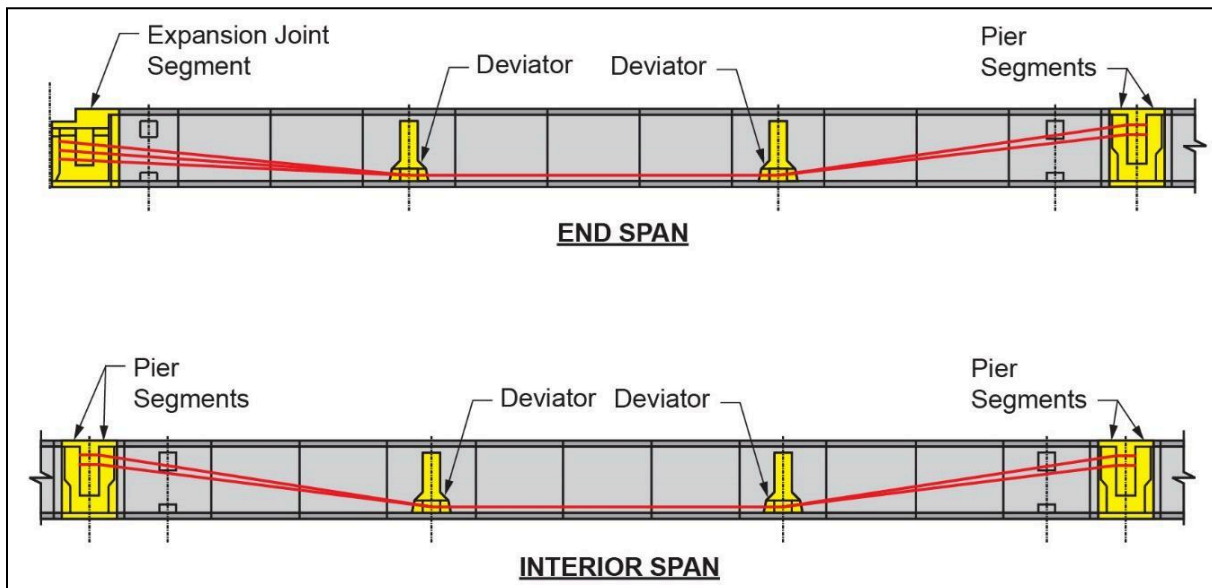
Different Elements within a Precast Segmental Span-by-Span Bridge
